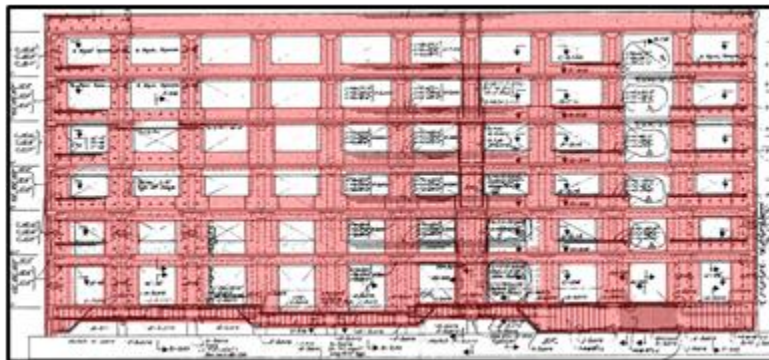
The reinforced concrete pier and spandrel system (red highlight) installed in the 1971 retrofit. See Figure 5 for the detailing of the added pier elements around the existing columns and attachment to the exterior brick masonry by the small + marks. At the bottom, the piers terminate into a heavily reinforced concrete grade beam.
